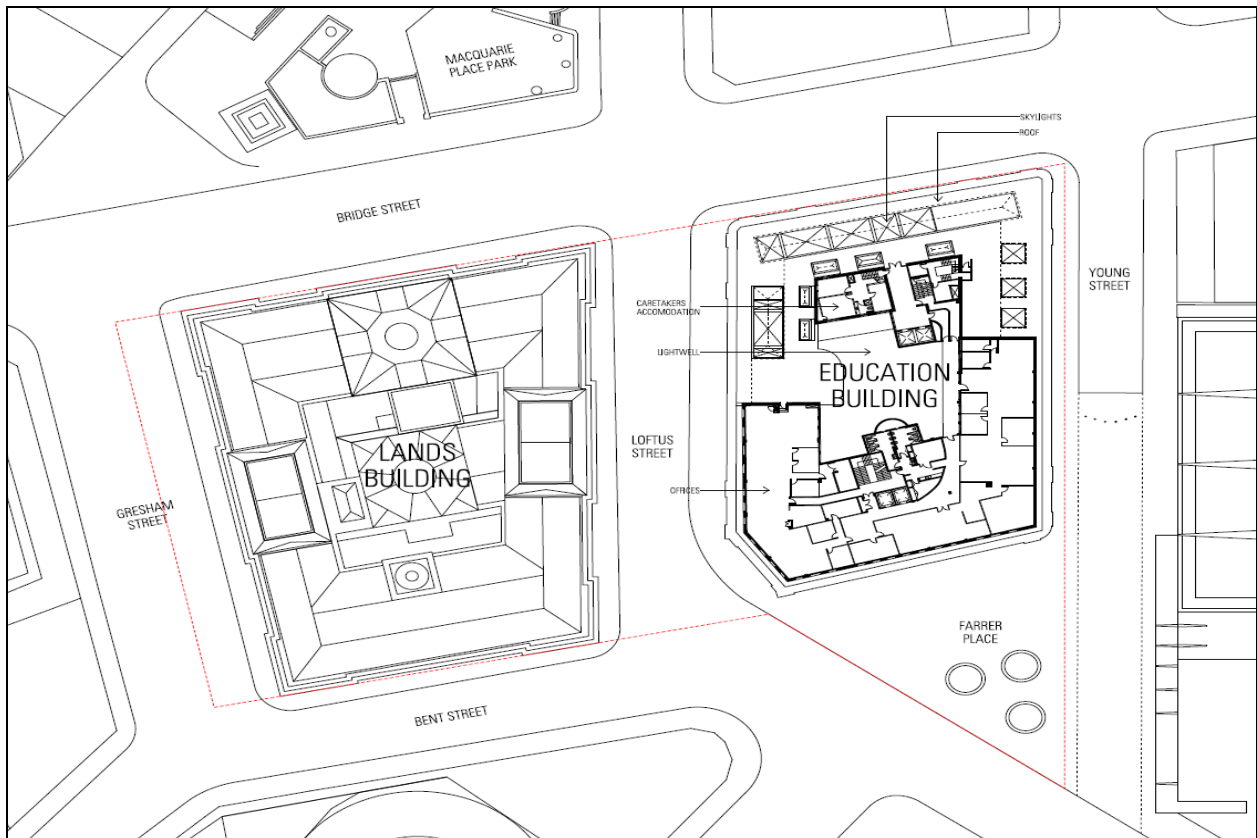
Aerial Layout of existing site marked in red and immediate surrounding context
